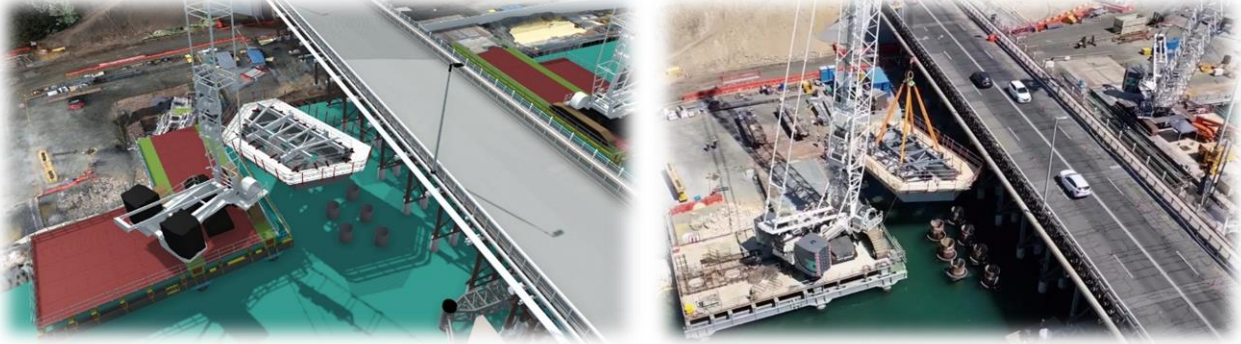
Digital image and corresponding photo of South-East pile cap shell installation
